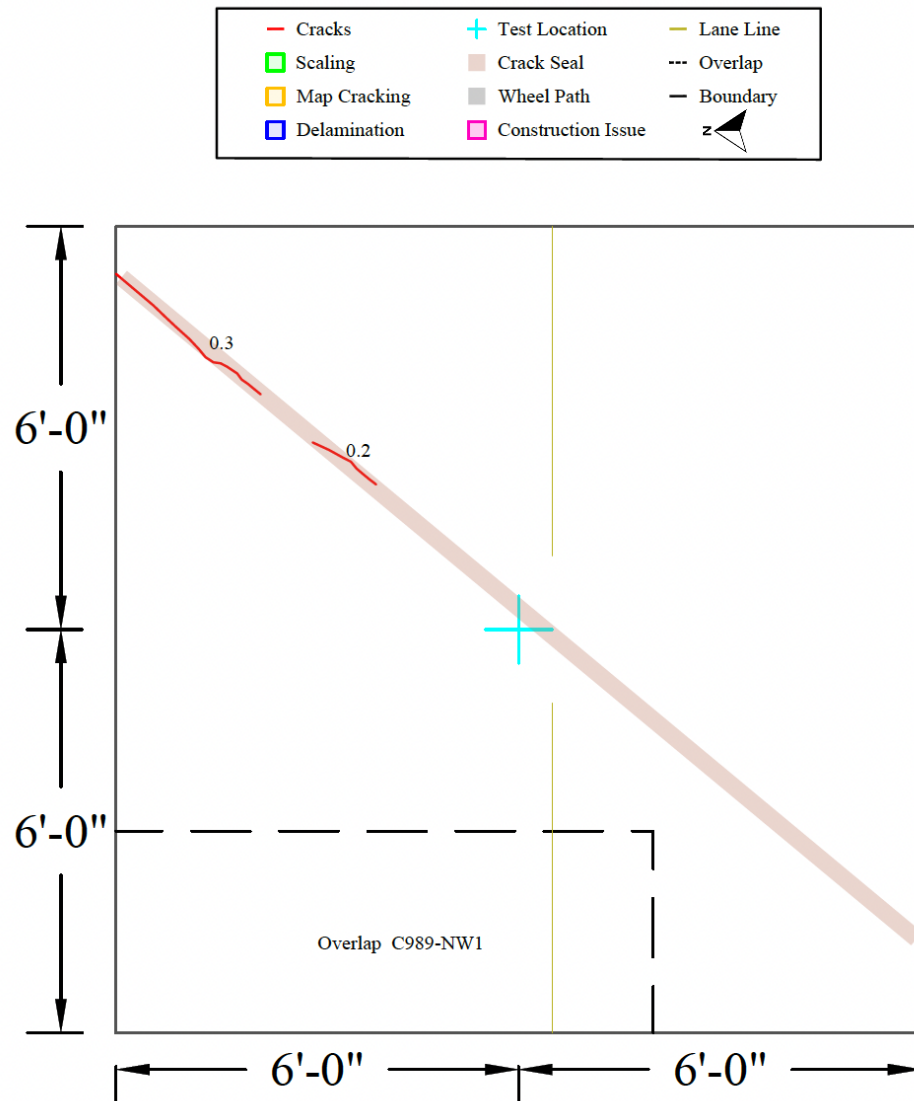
Test location 2 of normal-weight concrete approach slabs at bridge C-989.
